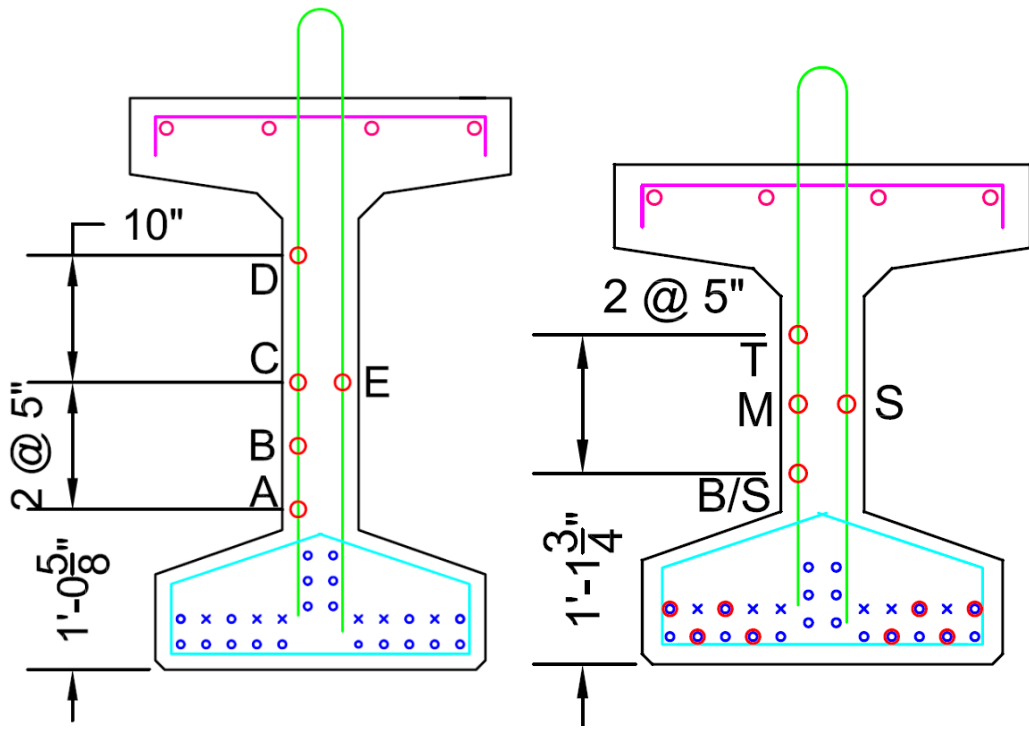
Cross-sectional view of strain gage locations for 45M (left) and 36M (right) prestressed concrete girders.
